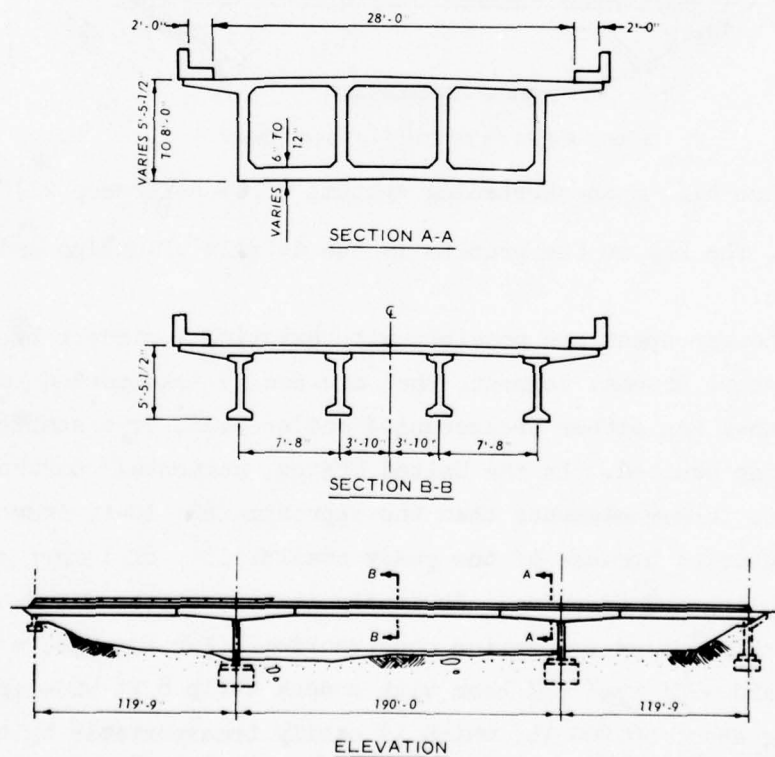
Elevation and sections of the bridge superstructure (from Reference 24)
